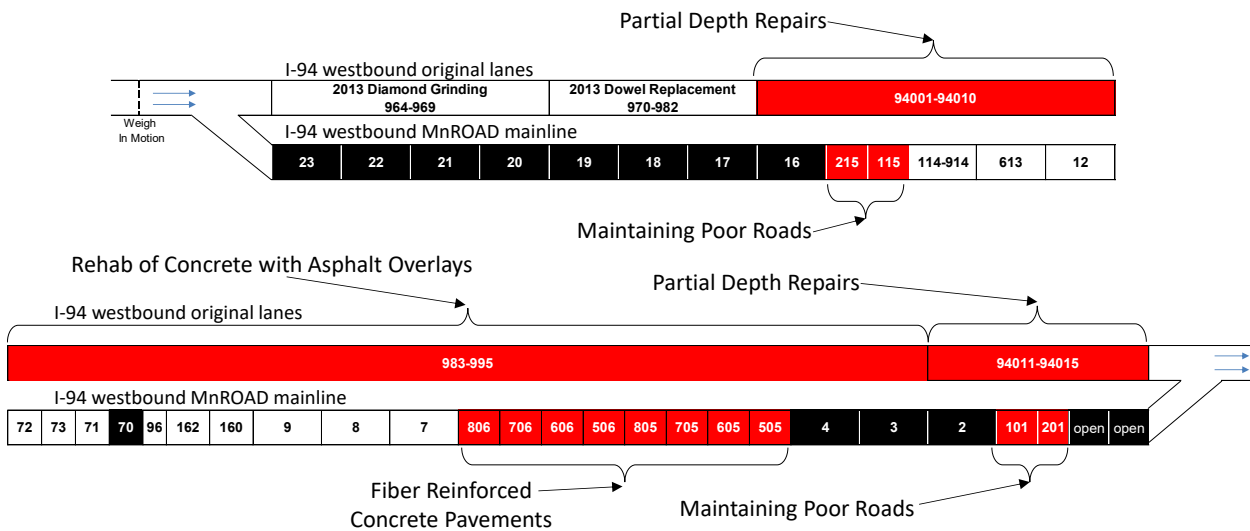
MnROAD I-94 WB (original and mainline) NRA sections.
